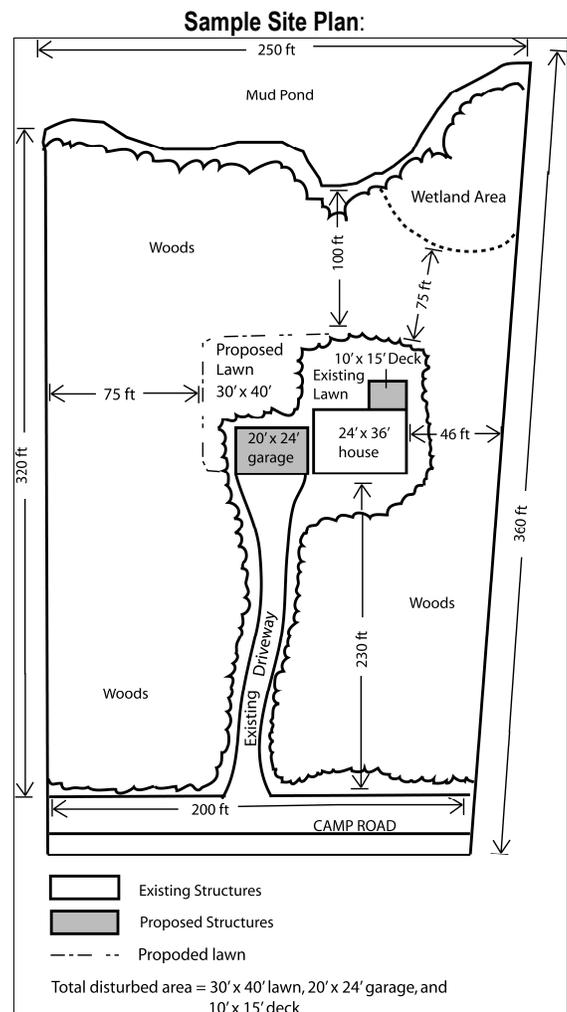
EXHIBIT D: SITE PLAN. Prepare a bird’s-eye view site plan that shows your entire property. Draw the plan to scale on an 8½ x 11” sheet of paper. Do not use colors as they do not photocopy. Include the following features:
